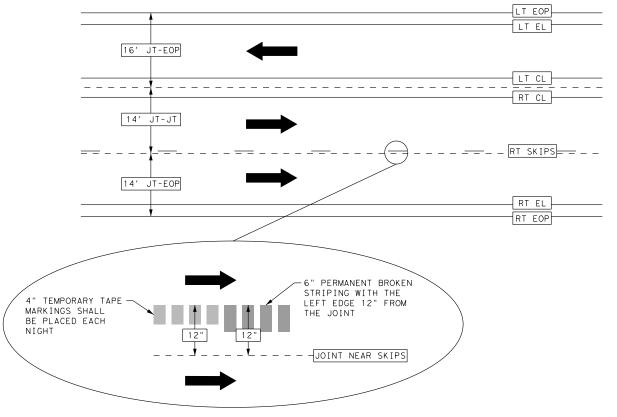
TYPICAL JOINT-PAVEMENT MARKING CONFIGURATION
